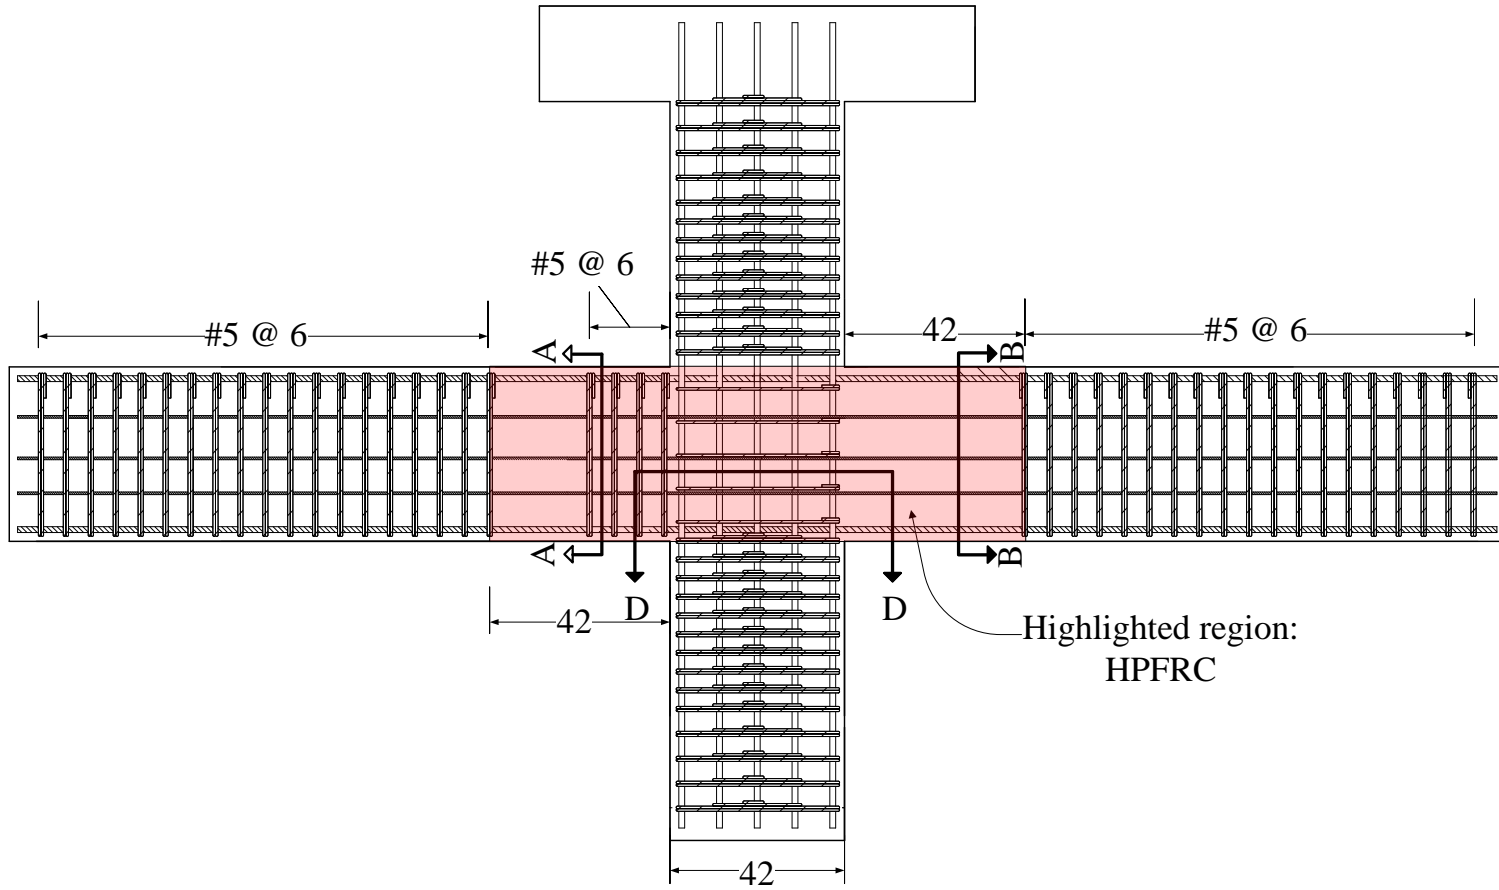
Reinforcement detail of HPFRC-SP-CL
